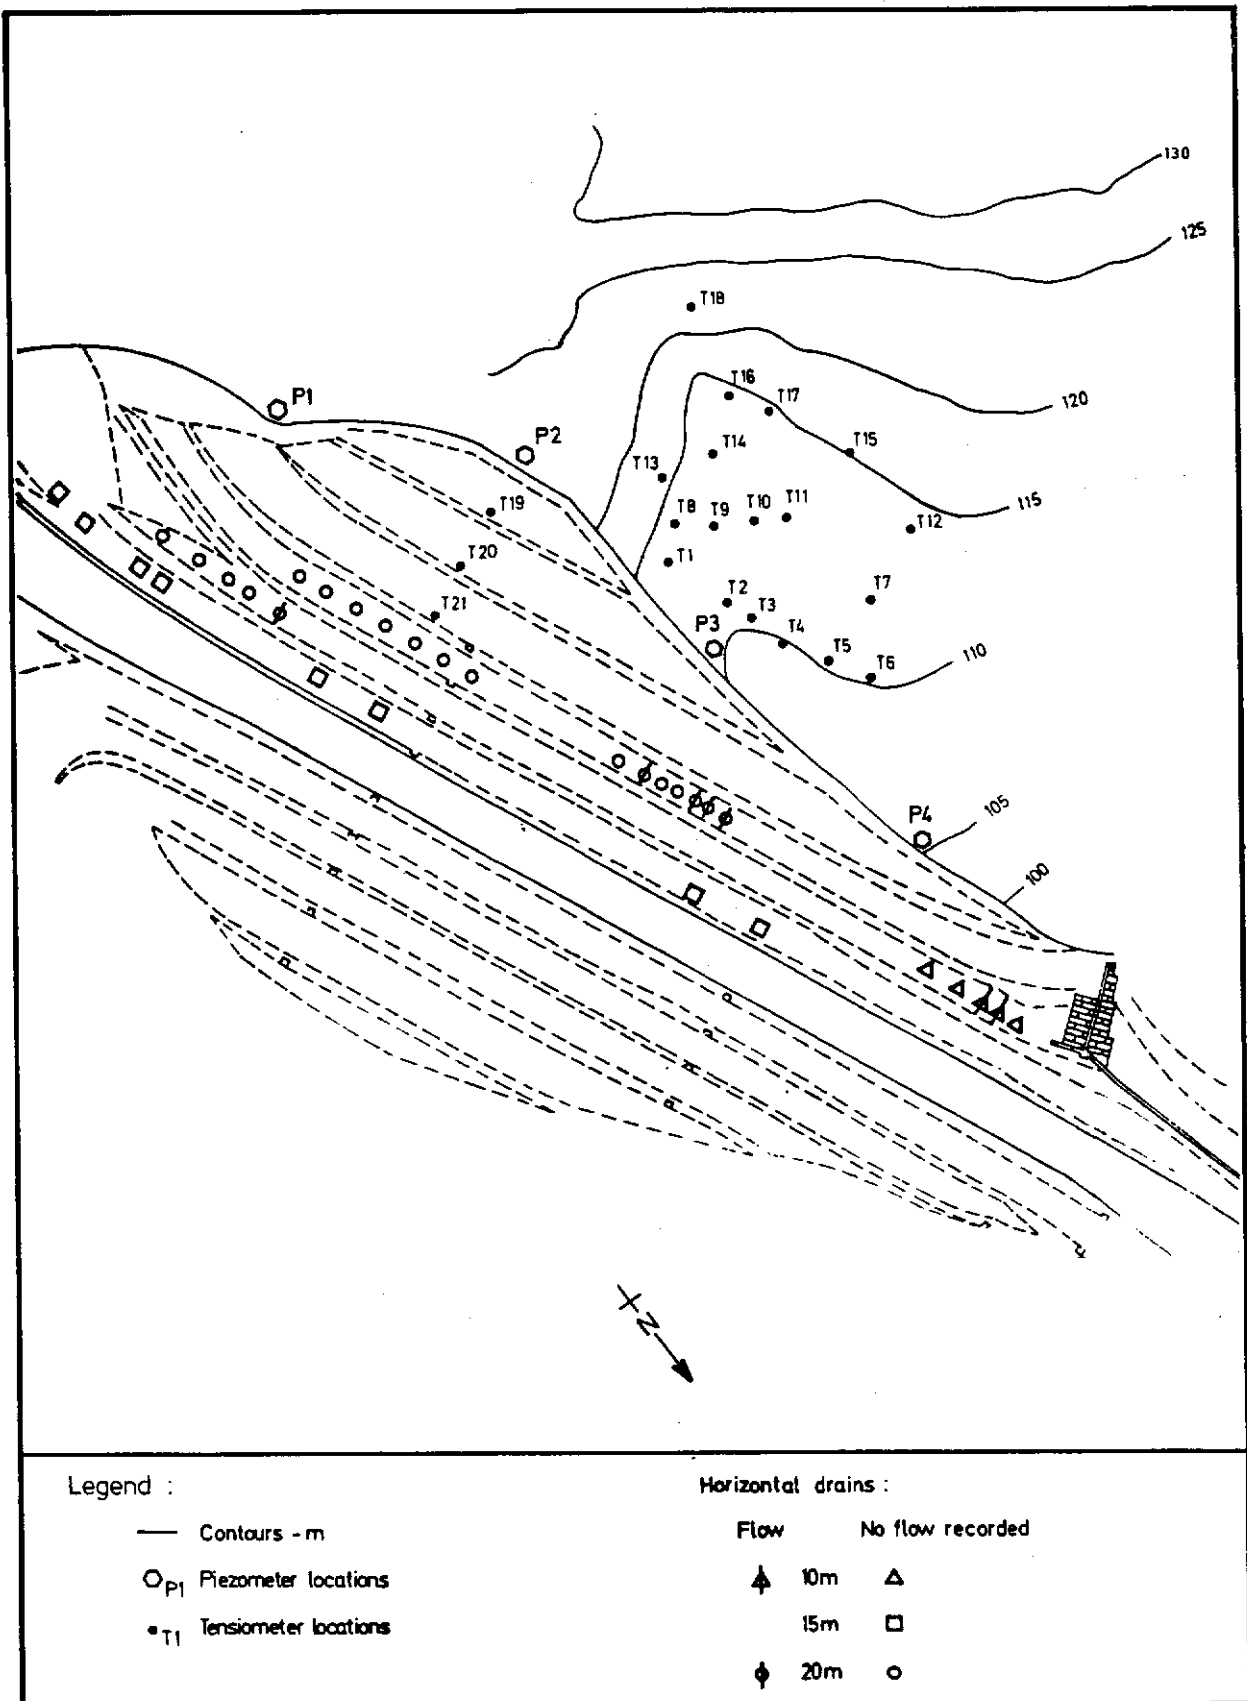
Instrumentation plan, showing tensiometer, piezometer and horizontal drain locations
